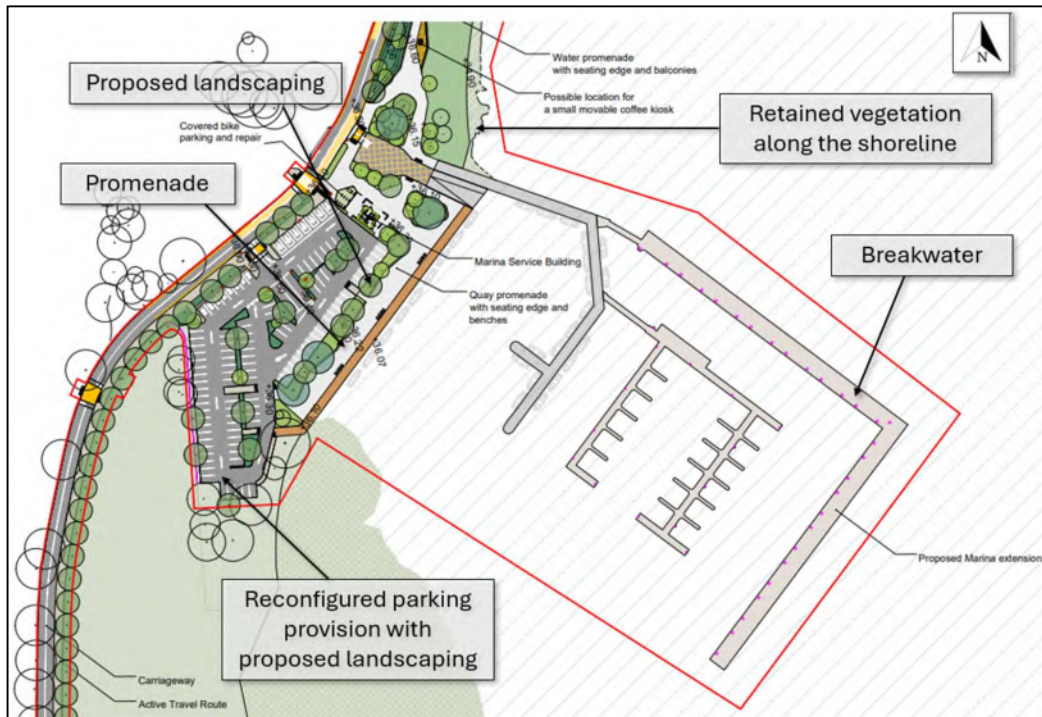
Plan layout of the Marina Redevelopment and Extension, extracted and modified from drawing no. HBWP-ZZ-ZZ-DR-OKR-LA-001100
